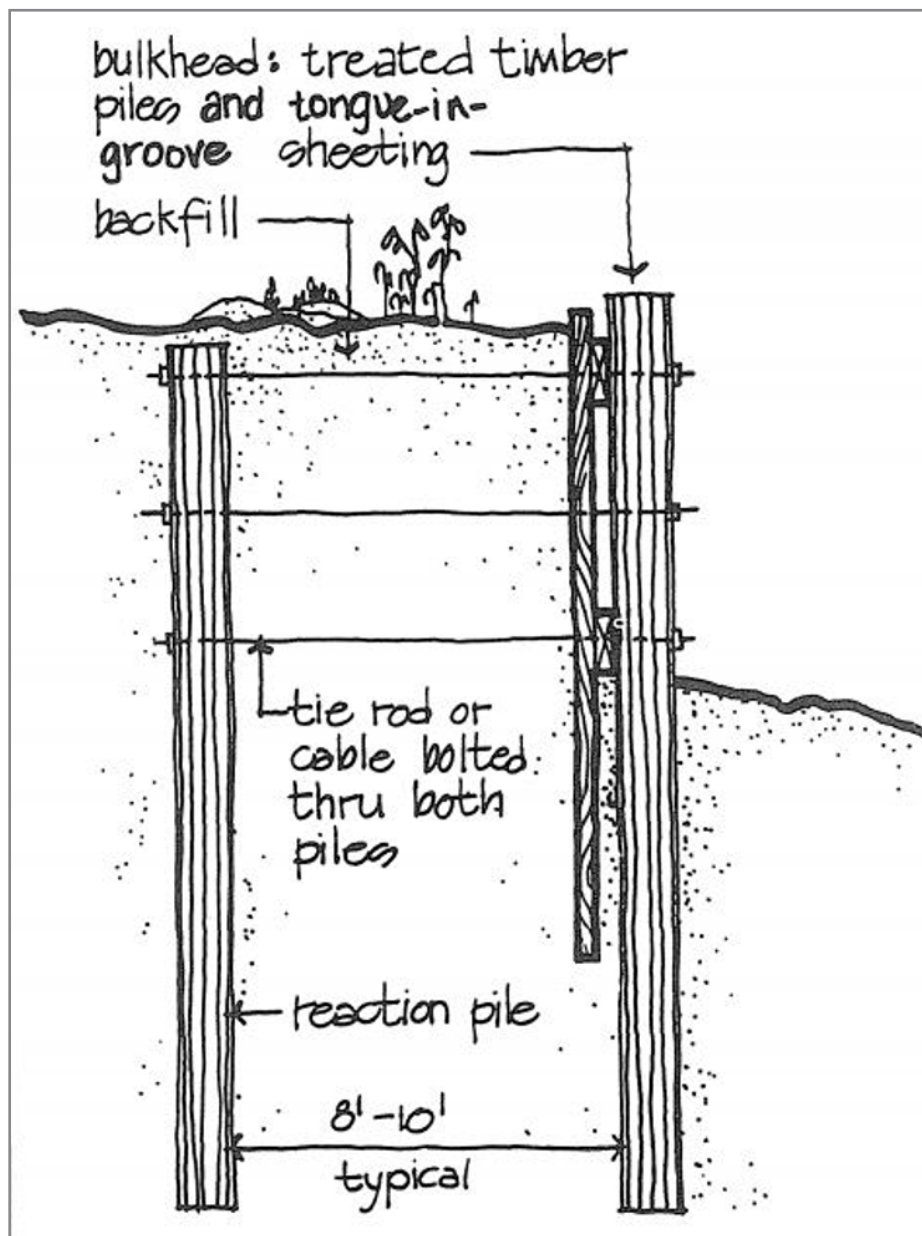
Schematic Bulkhead Example (Source: EPA)
